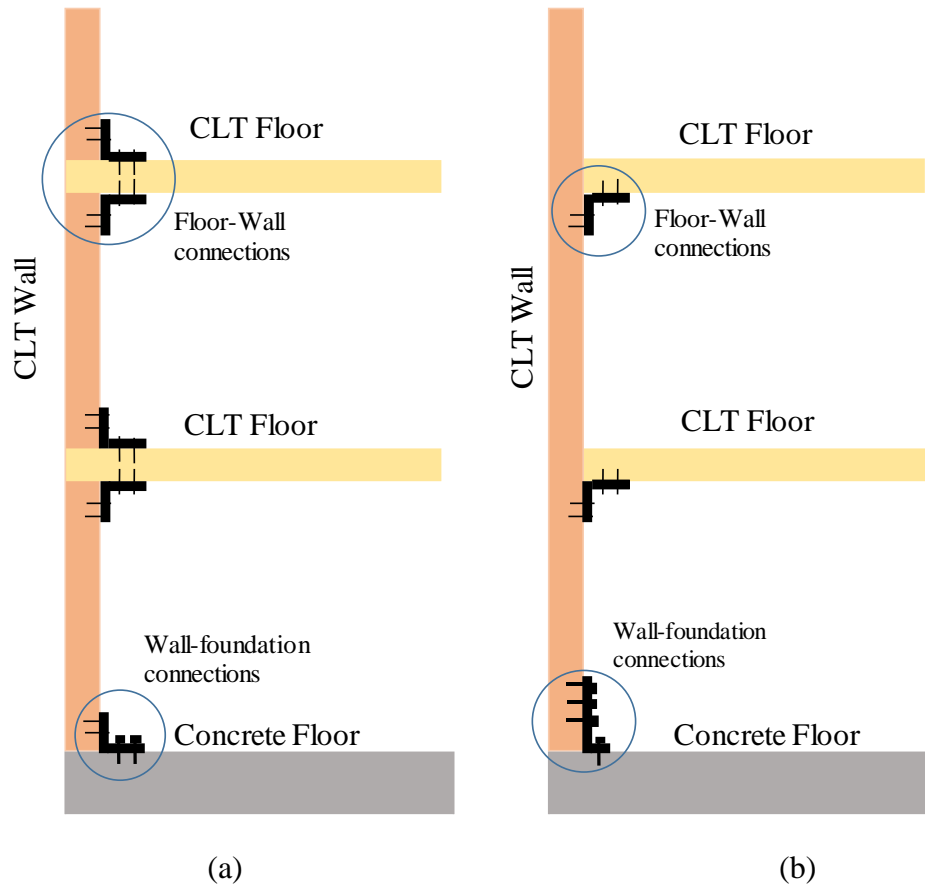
CLT structural system: (a) platform-type and (b) balloon-type construction
